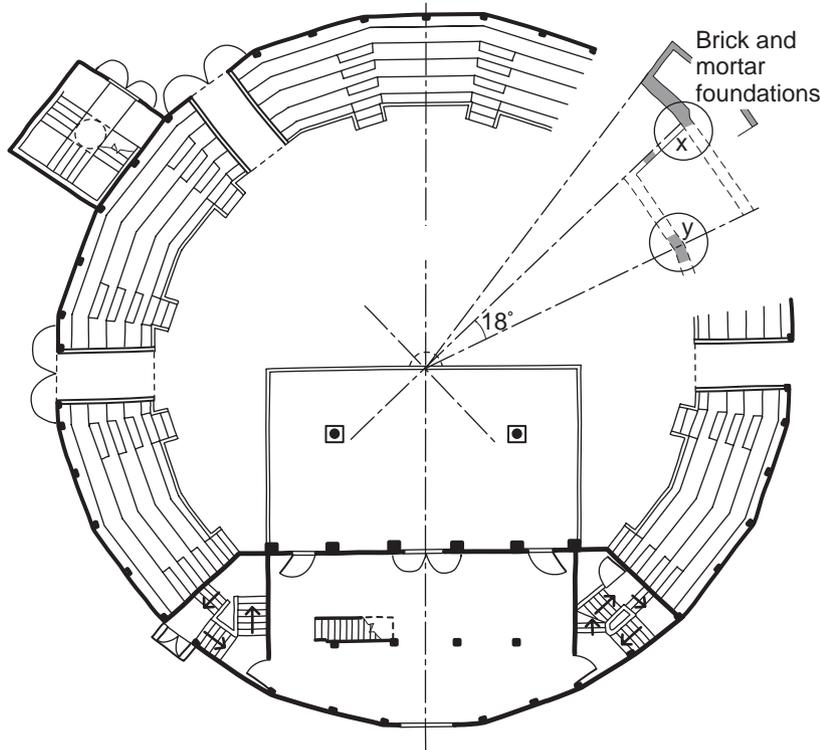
Plan of the Globe, with archaeological excavations superimposed. Although the exposed area was small, the changes in footing alignment at X and Y allowed the determination of the overall building diameter and gallery width, and confirmed the plan form as a twenty-sided polygon. A stair tower footing was also found, which was enlarged in the rebuild to meet current regulations
